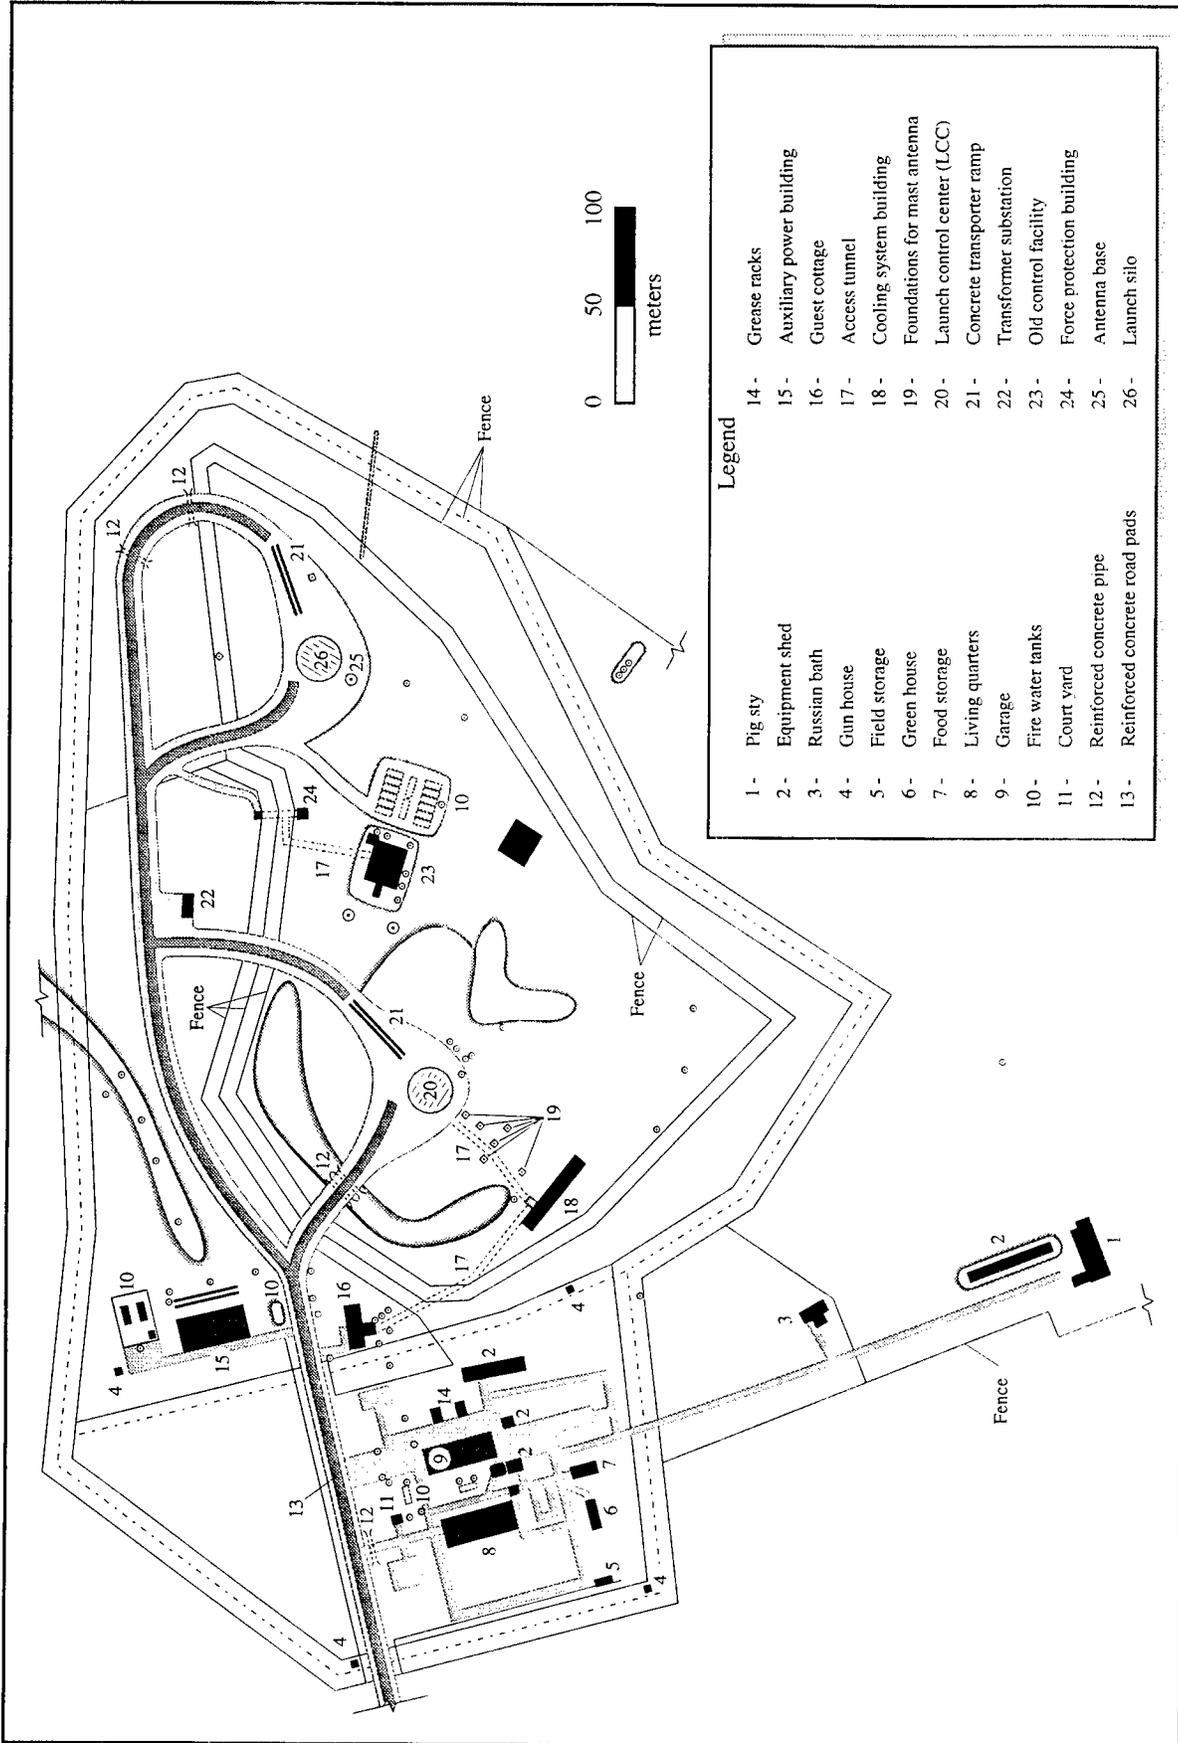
Plan drawing of a typical co-located launch silo and launch control center (LS/LCC) site. Derzhavinsk, Regiment 5 Silos 5/7.
